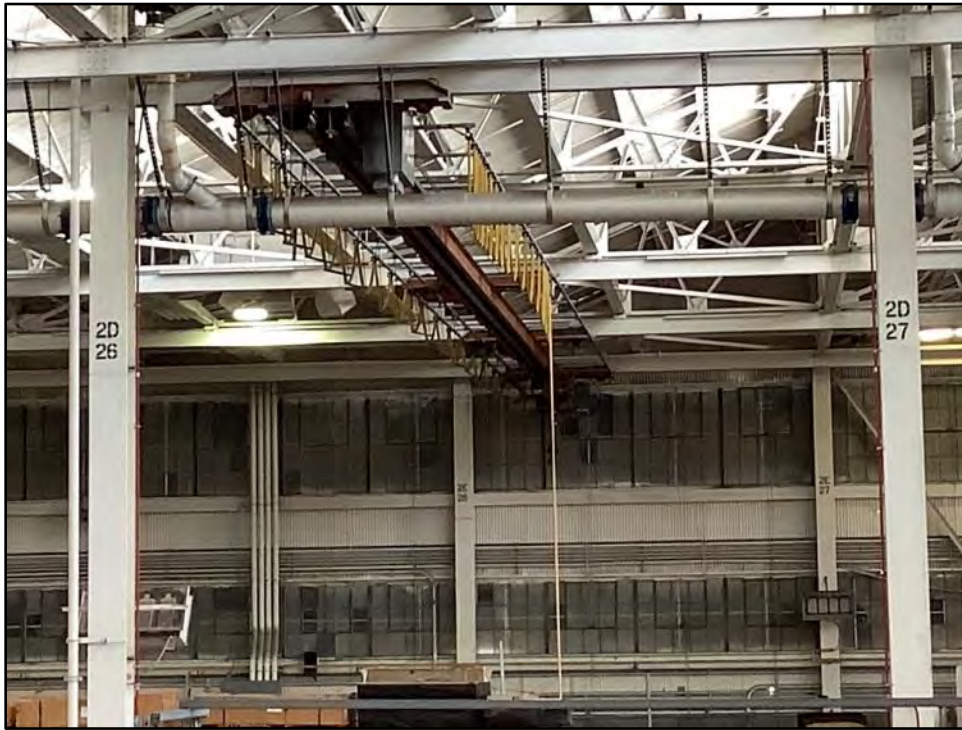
Building 2, Intact Typical Side Wall Steel Windows
